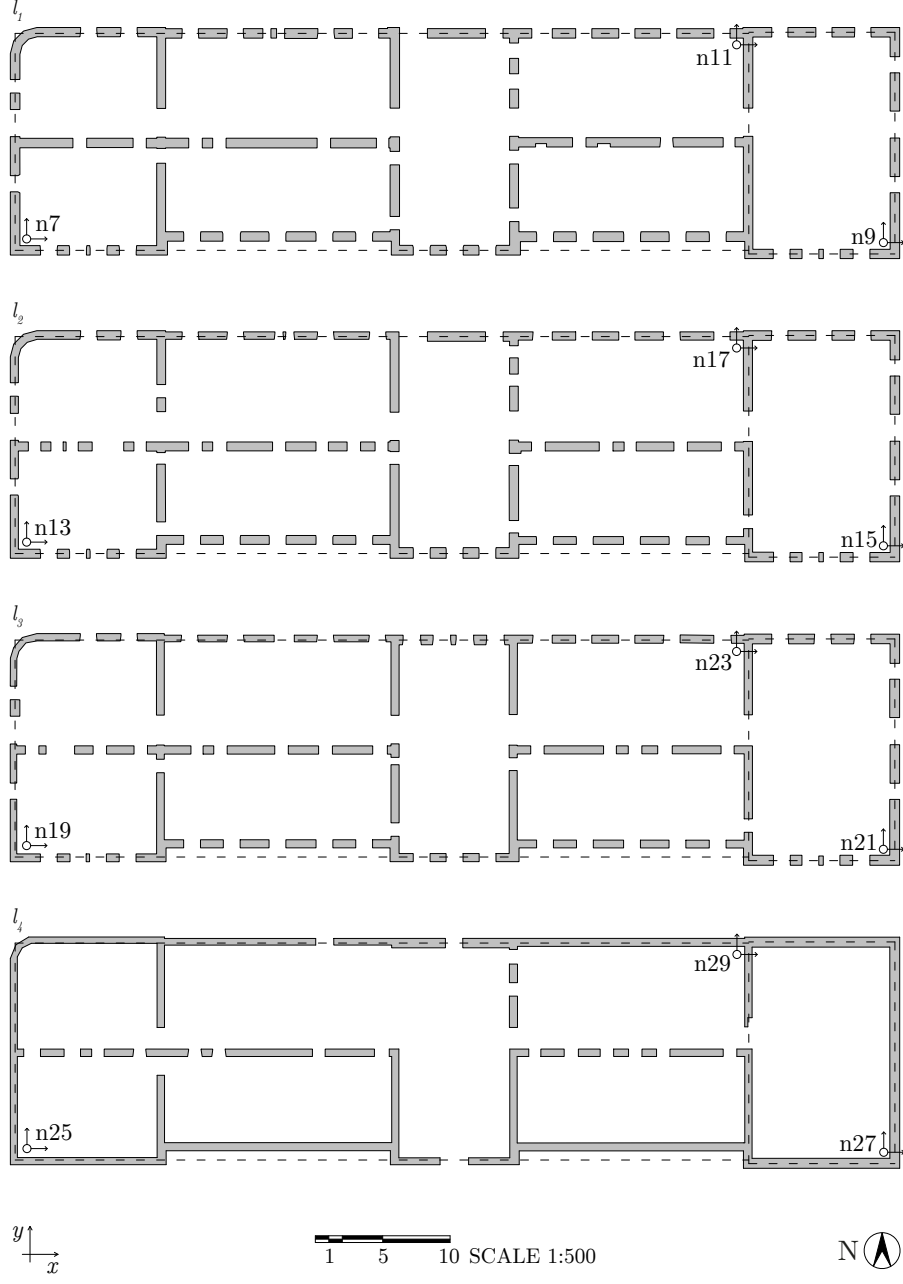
Structural plans of Bellevue palace, highlighting the position and orientation of the sensors.
